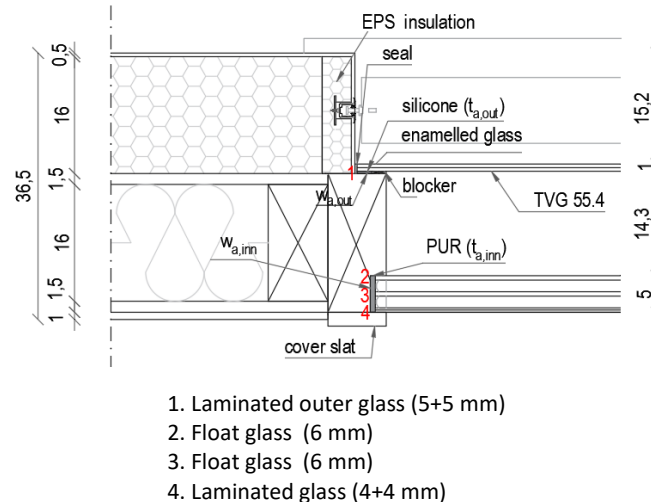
Schematic presentation of a DSF load-bearing structural wall element
